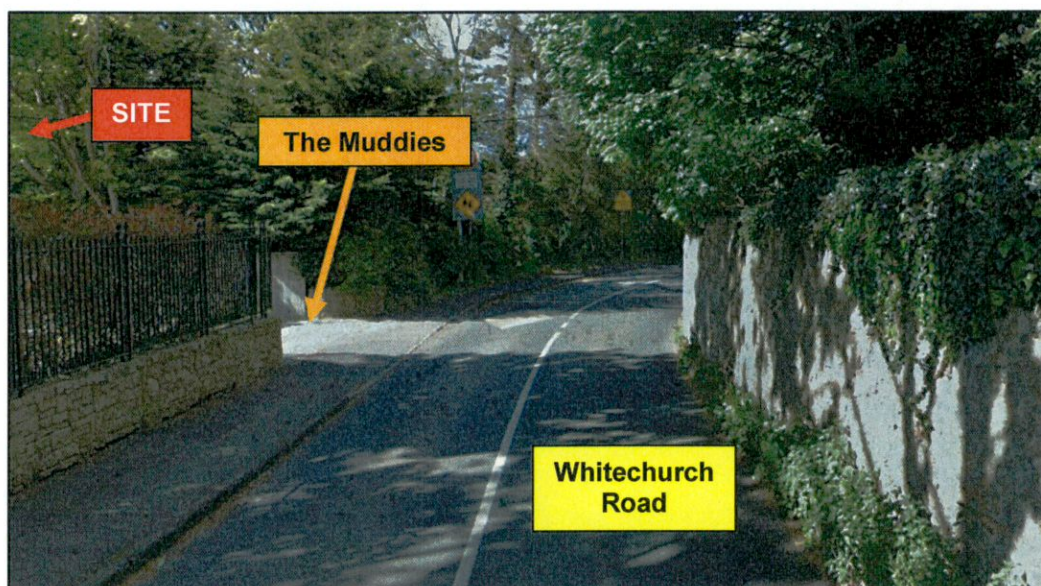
SITE AND SURROUNDING ROAD NETWORK
